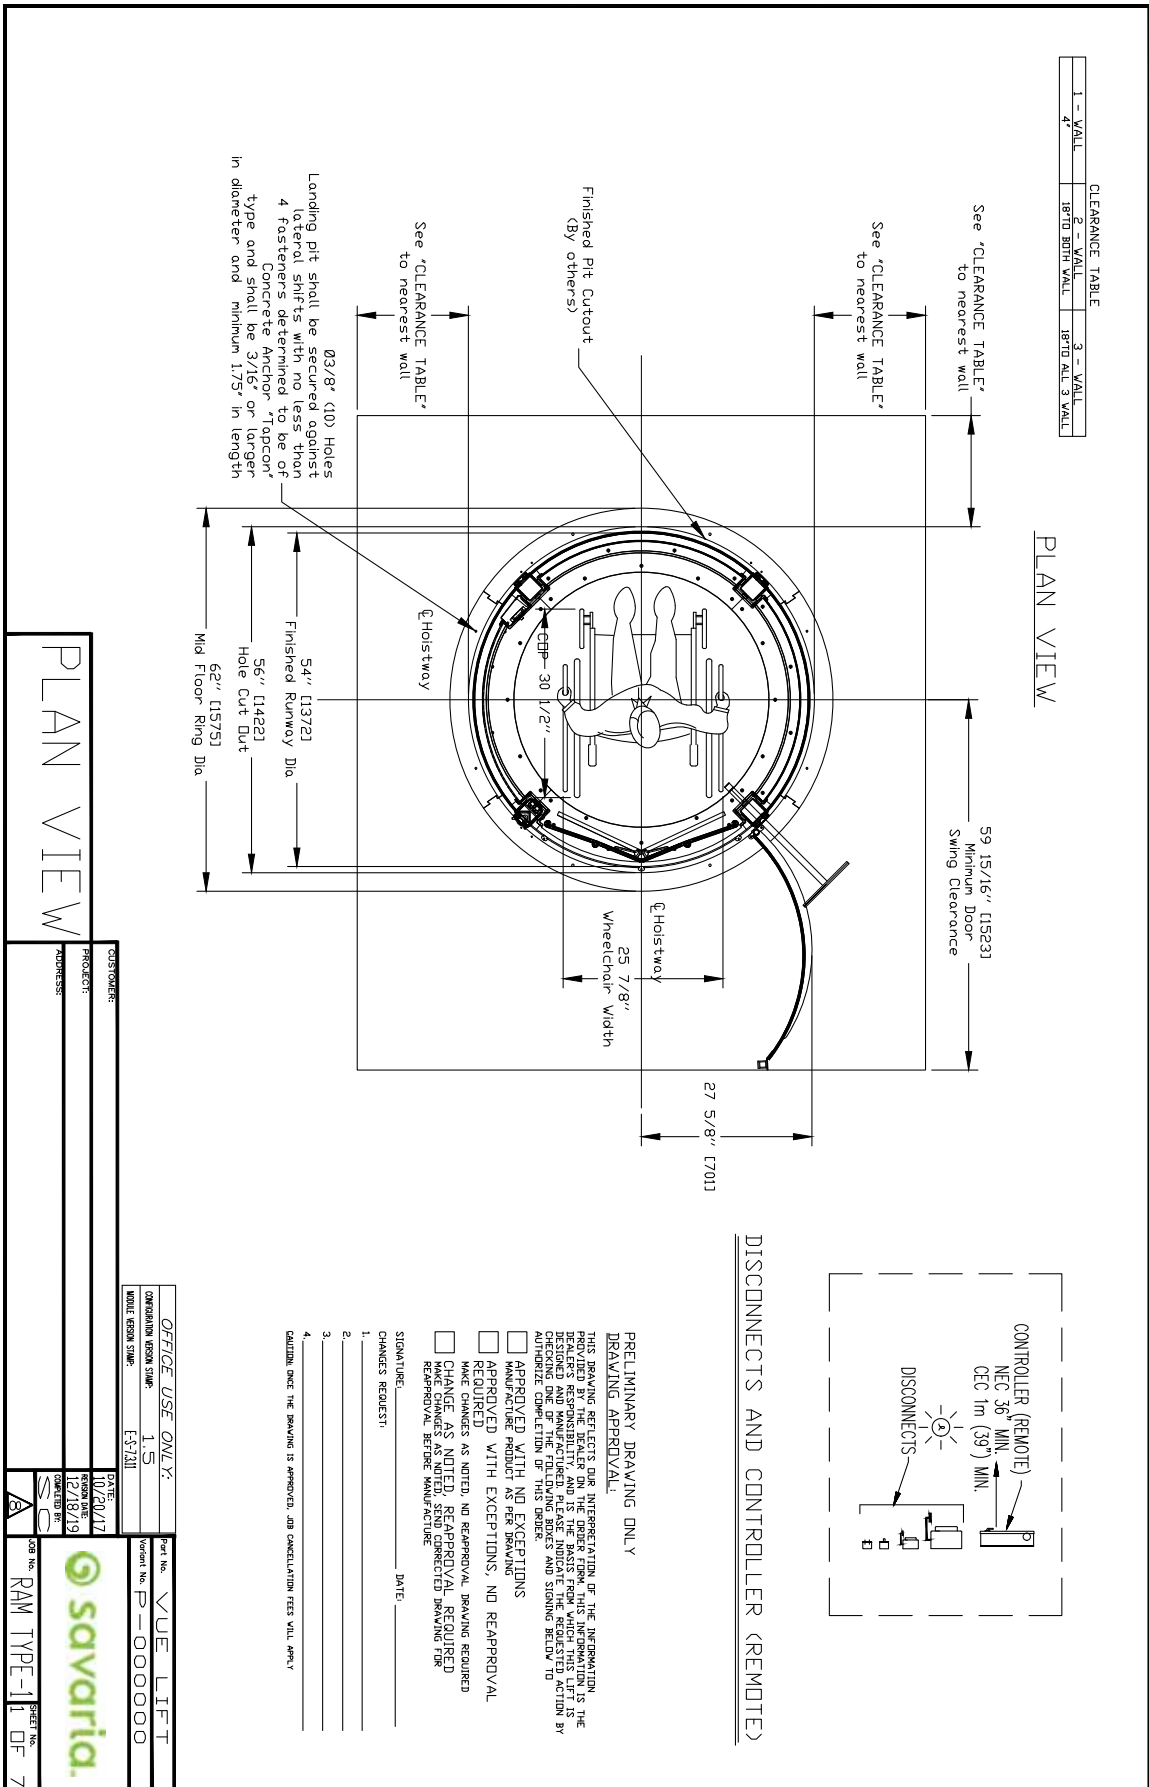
Pit/bottom floor/thru-floor view - round acrylic (RAM)
